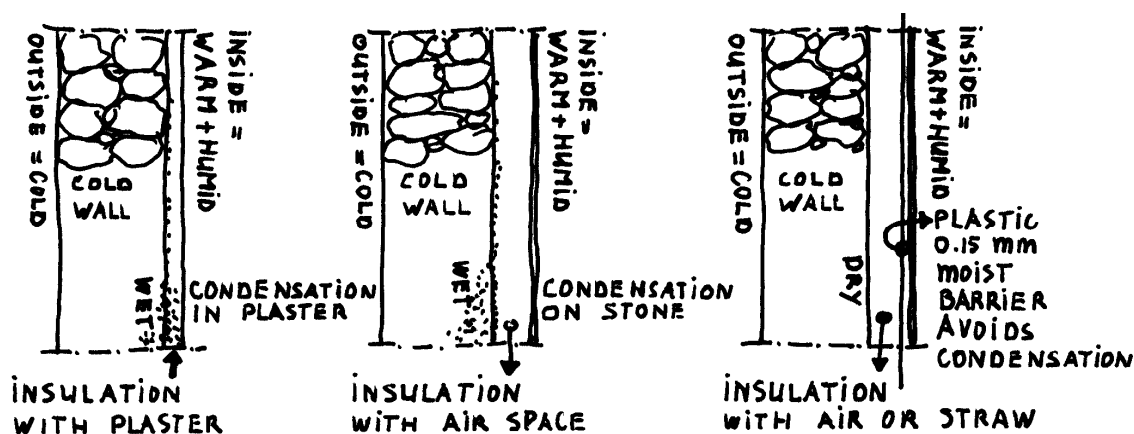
CONDENSATION ON COLD STONE OR CEMENT BLOCK WALLS
